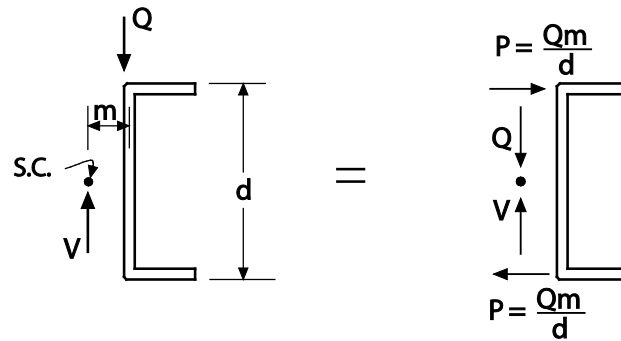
Lateral Forces Applied to C-Section
